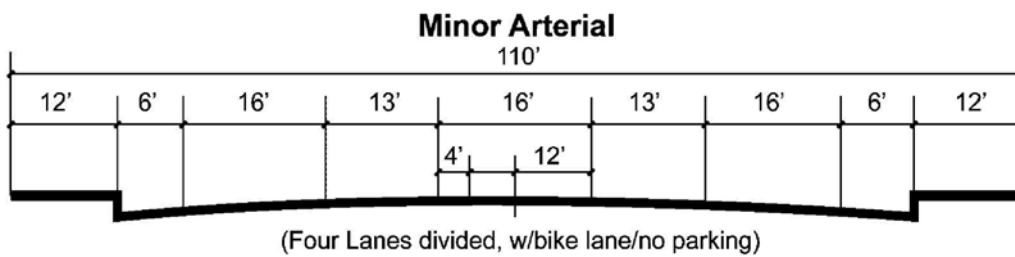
CITY OF RANCHO MIRAGE GENERAL PLAN CIRCULATION ELEMENT
